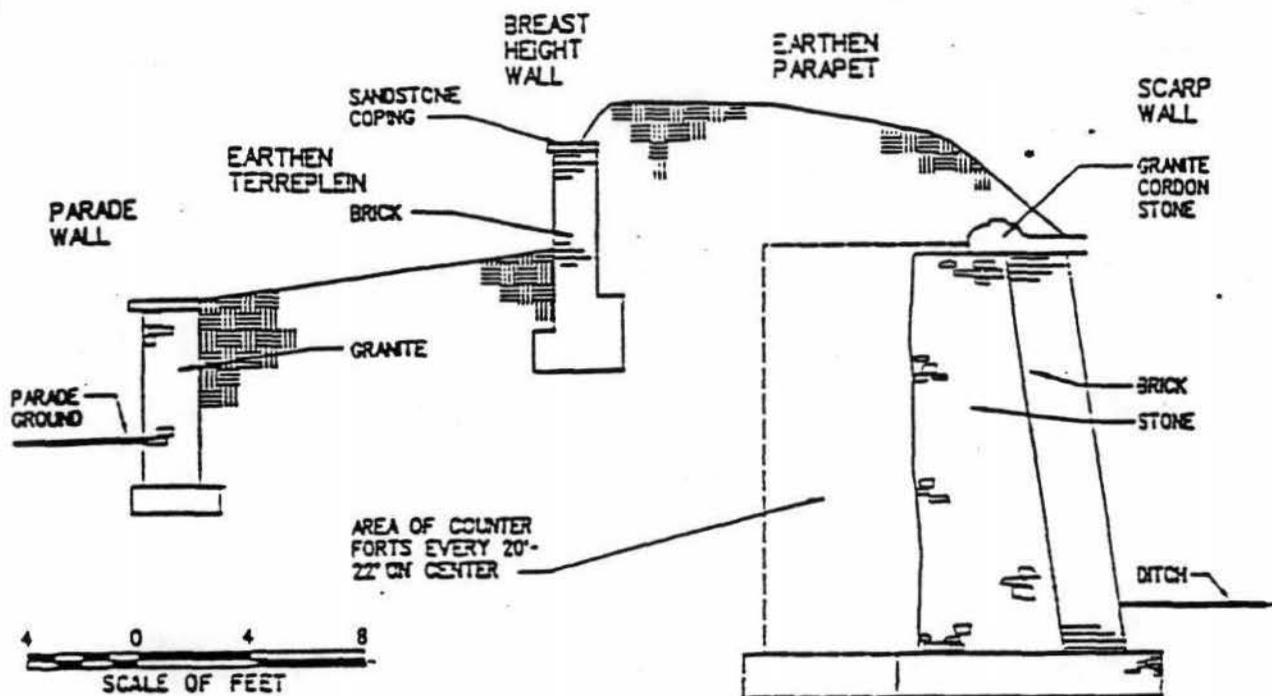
Diagrammatic section through the Star Fort showing the relationship between the scarp wall, breast height wall and the parade wall.
